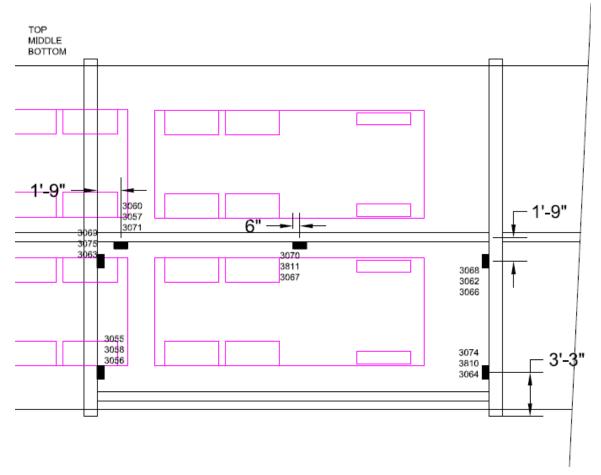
Gage locations for Bridge No. 3790 in Chester, ME
